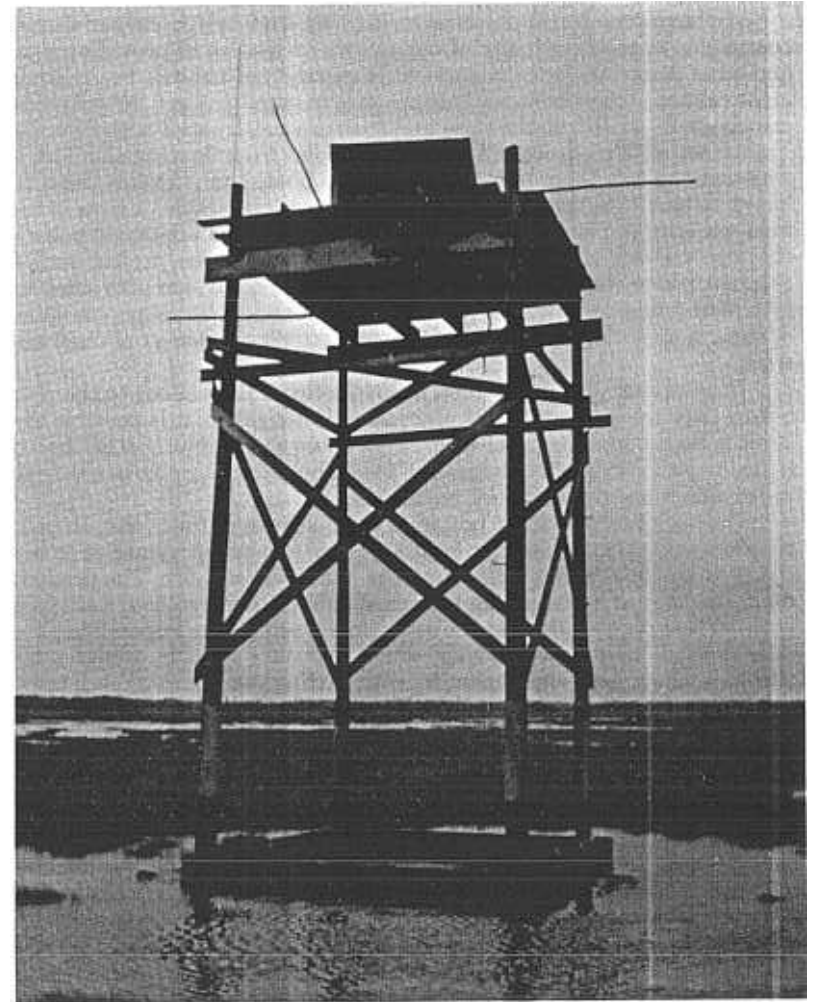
Tower type hack site showing mudshoe, crossbracing, and perches below platform. Note also lightning rods.
